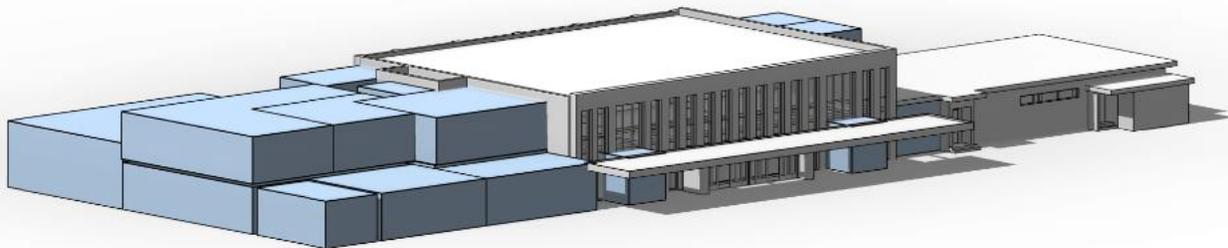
Alternative 4 – Existing Terminal Renovation
